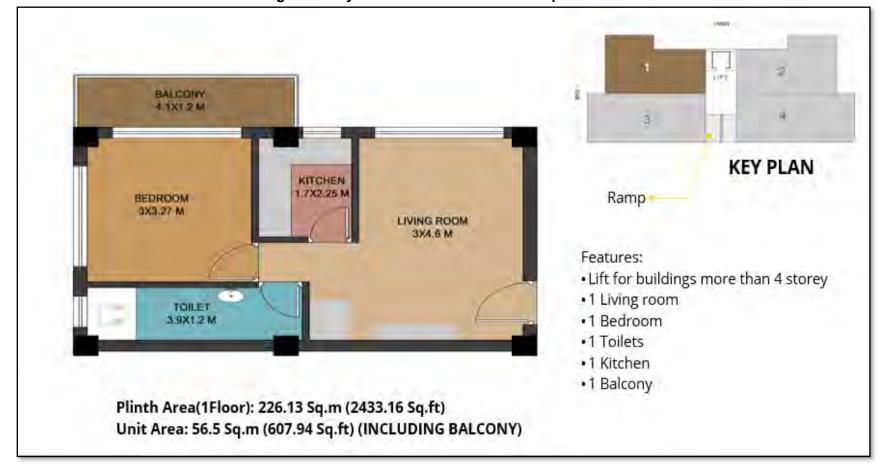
Layout Plan for One Bedroom Apartment<sup>28</sup>
